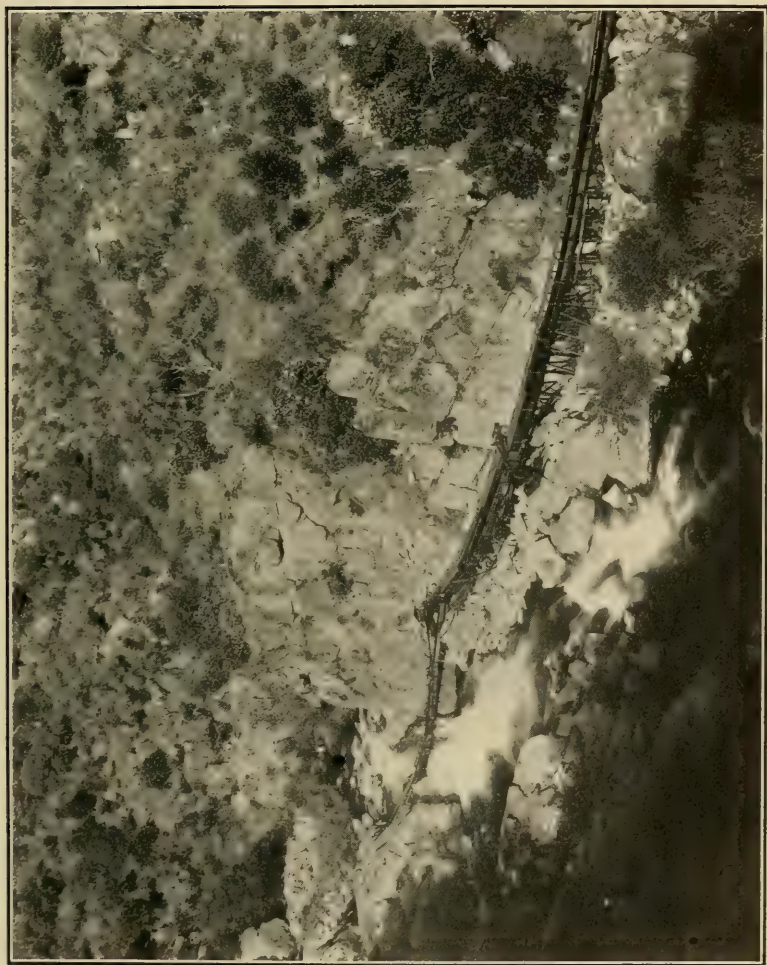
THE HEADWORKS, INTAKE TUNNEL AND FLUME OF THE MT. WHITNEY PLANT.
